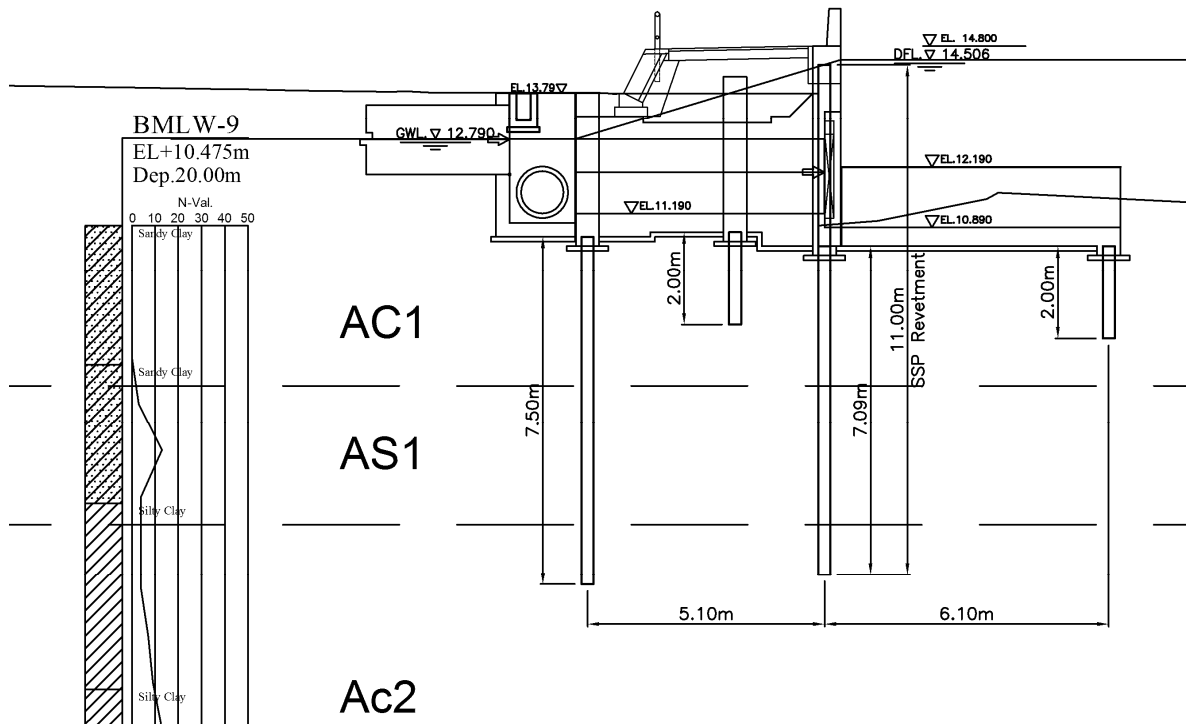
Length of SSP Cut off Wall (4/9) (MSL-4)
